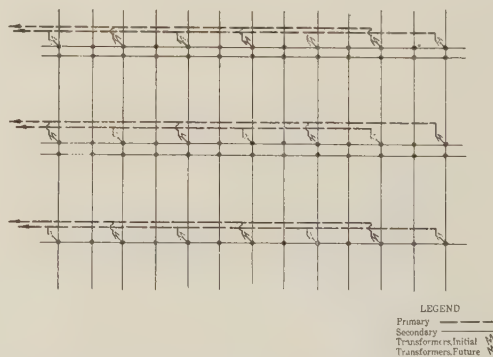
TYPICAL LAYOUT FOR FOURTH AVE. NETWORK
